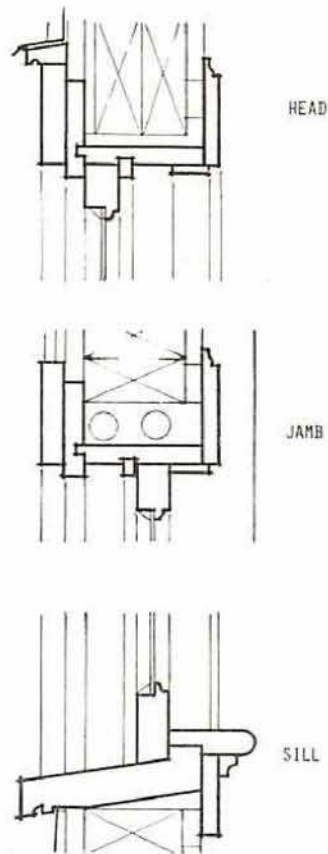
DETAIL OF EARLIER WOOD WINDOW
